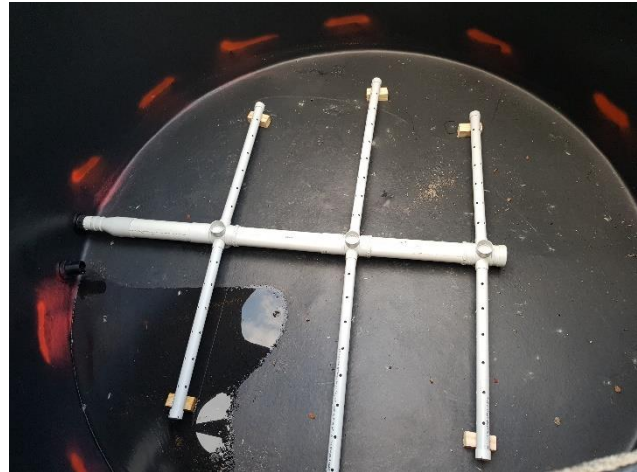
Photo of inlet tree drain installed in 15,000L tank.
